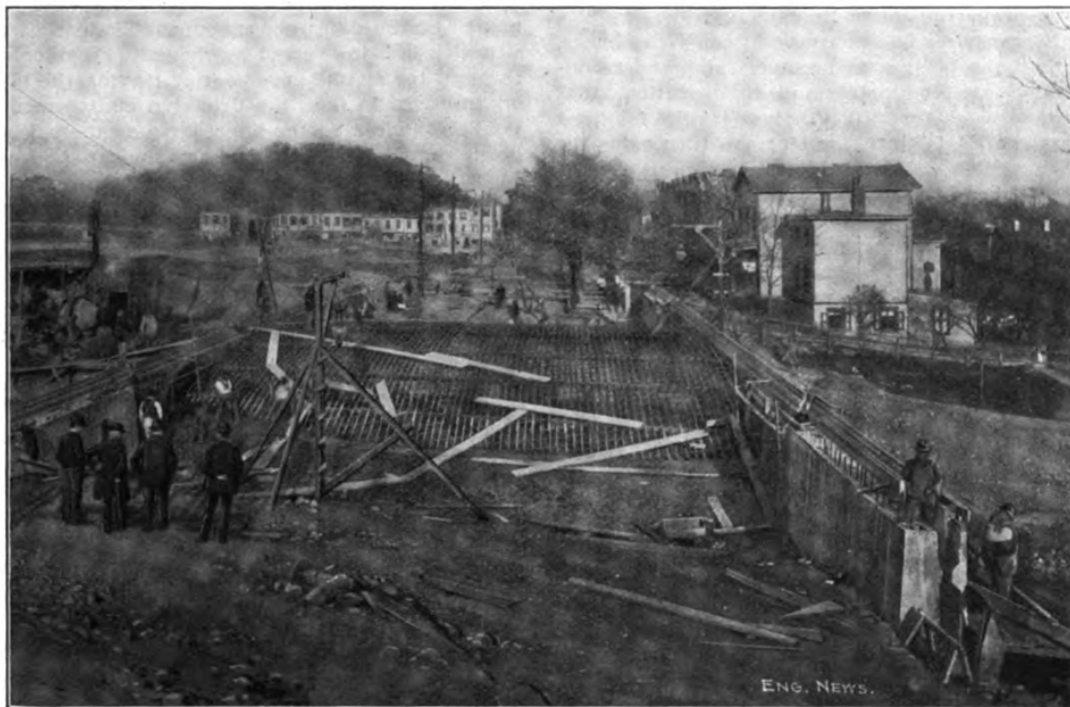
Construction of the bridge. Source: *Engineering News*, December 31, 1903, 588.
